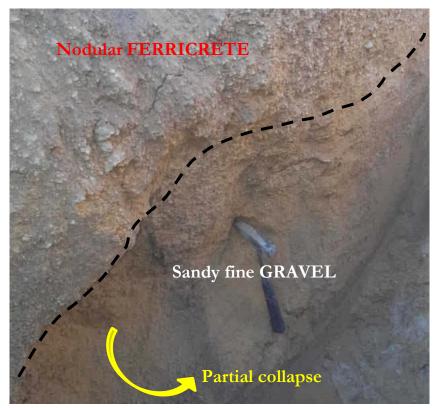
TP14 – Partial collapse of trial pit sidewall within the pinholed sandy fine gravel horizon; prior to water level rise.
